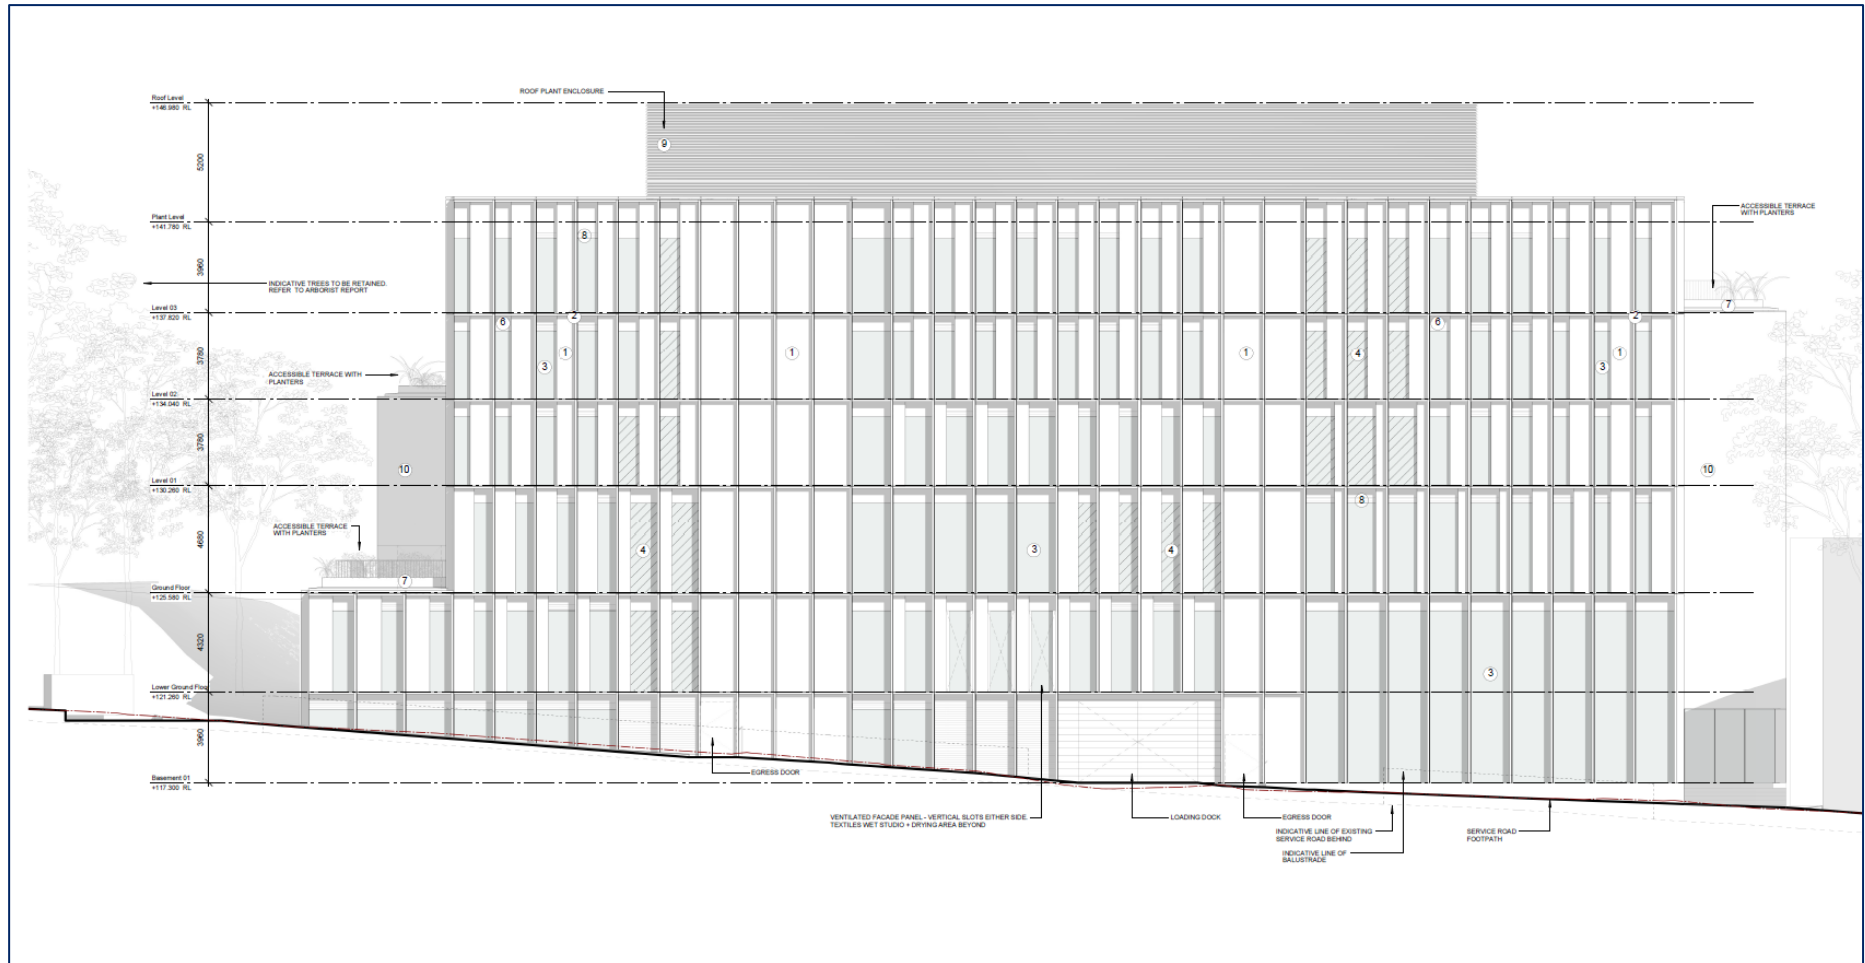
| North elevation (Source: Applicant's EIS 2025)
